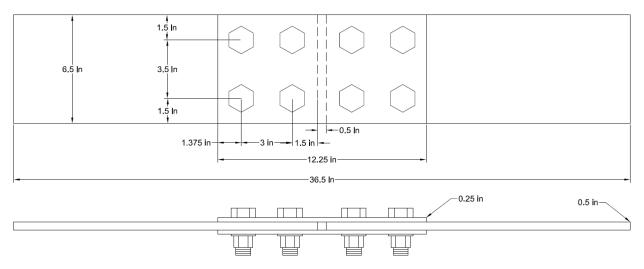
Dimensions of the ¹/₂ in. gap splice connection specimen.
